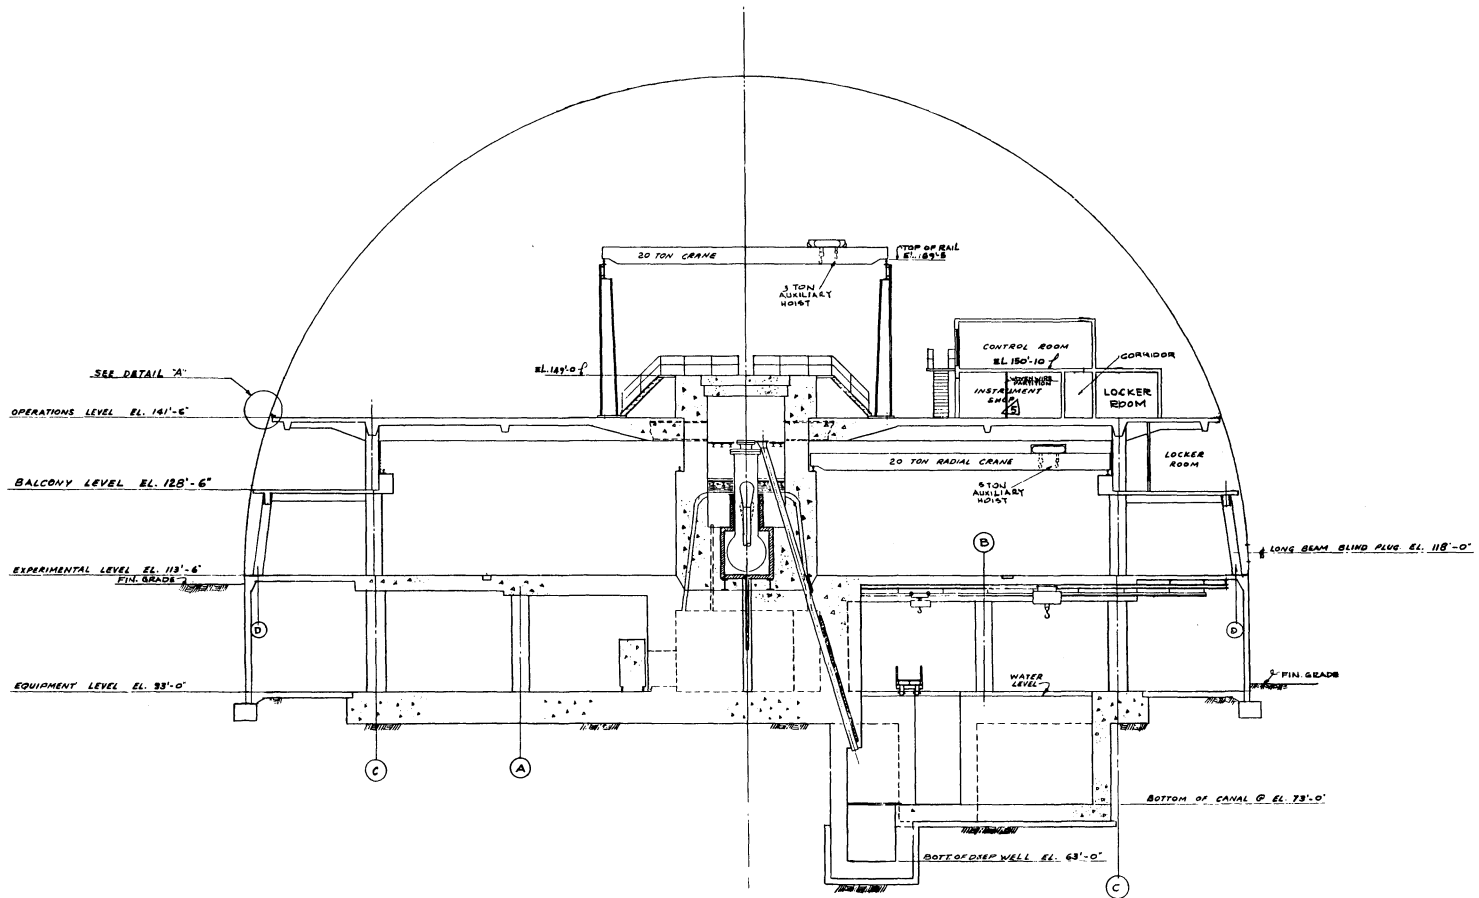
Elevation of the HFBR building in the east-west direction.
